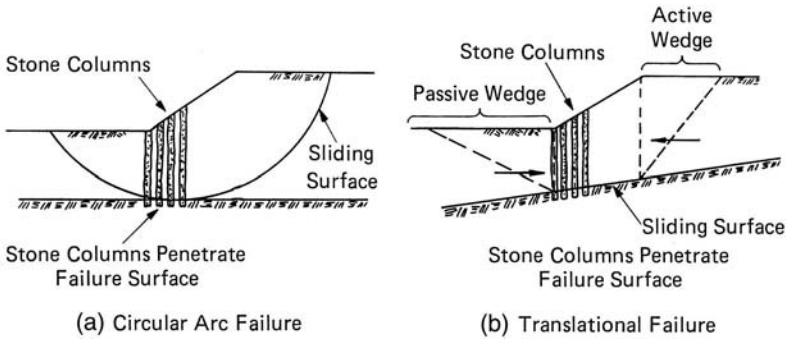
Use of stone columns or rammed aggregate piers to increase slope stability
